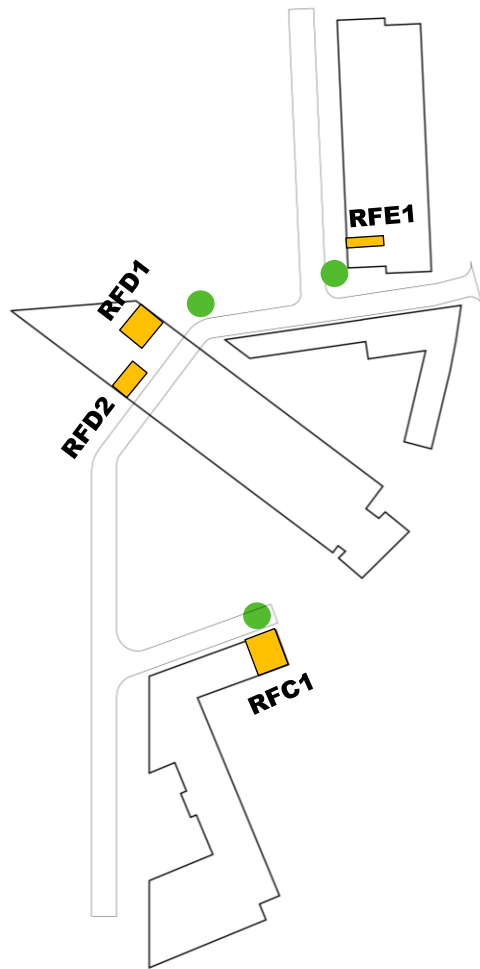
Ground Floor Plan highlighting all Refuse Rooms + Collection Points| NTS
